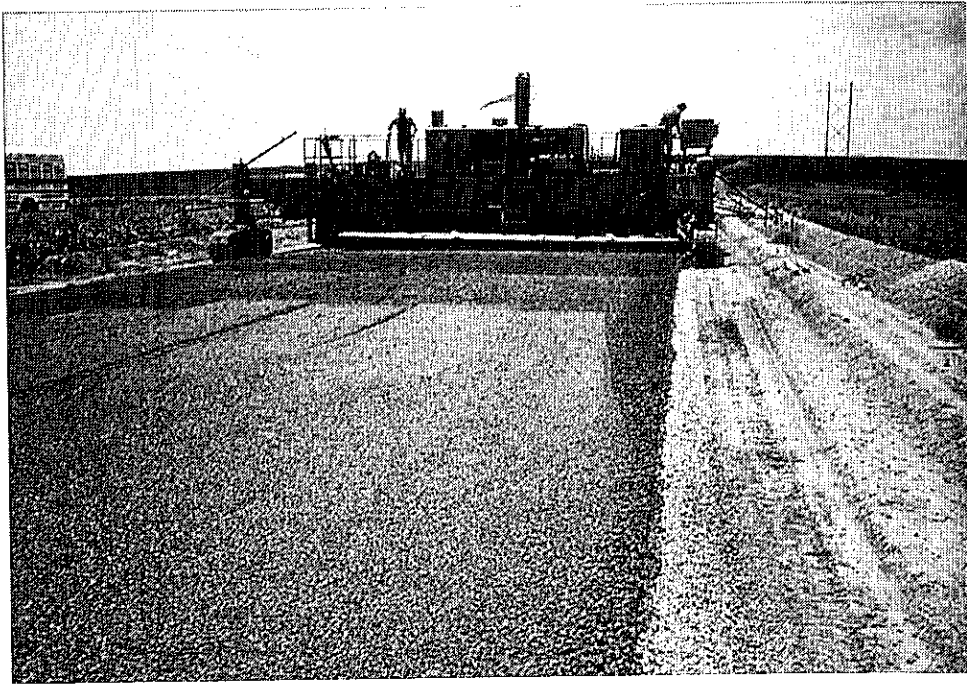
Rex Town and county paver used to construct the Bloomington test section.
